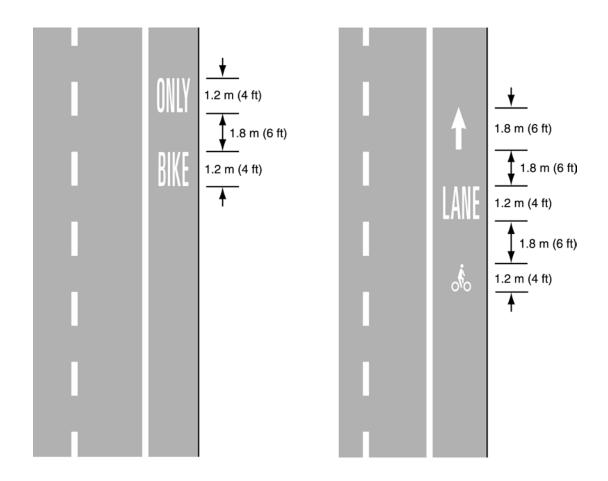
C-5. Typical Pavement Markings for Bicycle Lanes on a Two-Way Street
